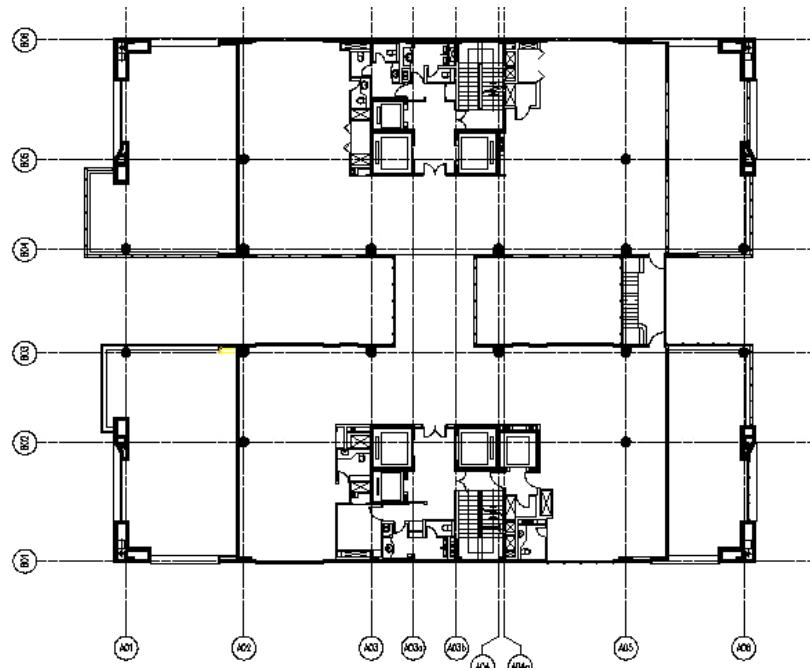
Birla Corporate Office, New Delhi: Ninth Floor Plan
